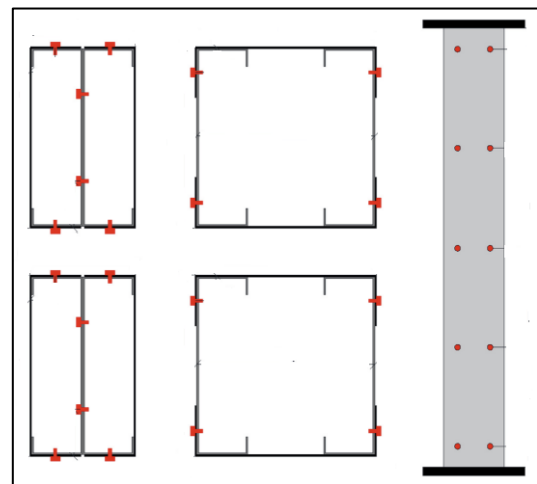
Example of the built-up CFS section using four channels (all dimensions in mm) [23]
